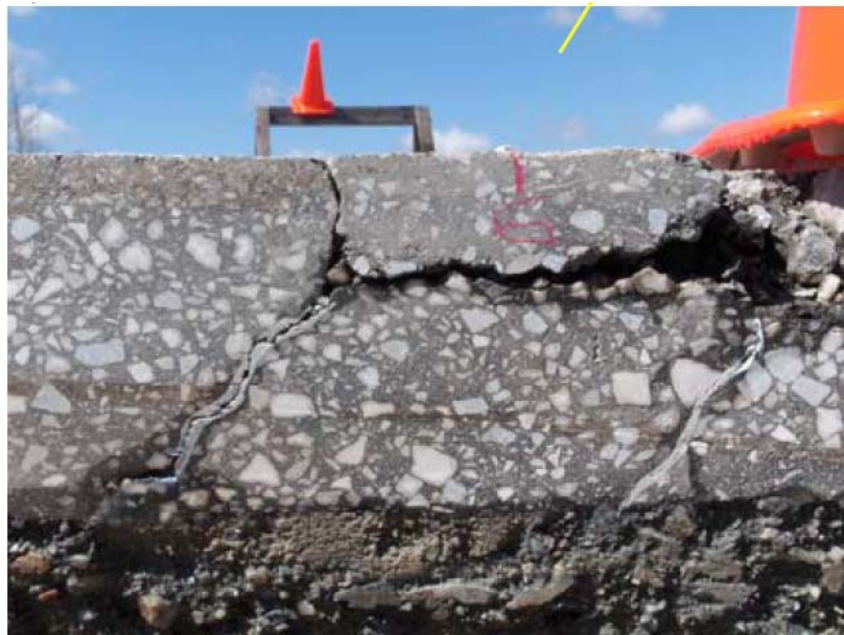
Trench face in N8 showing cracks originated from delamination at 1/2 (Willis and Timm, 2009).
